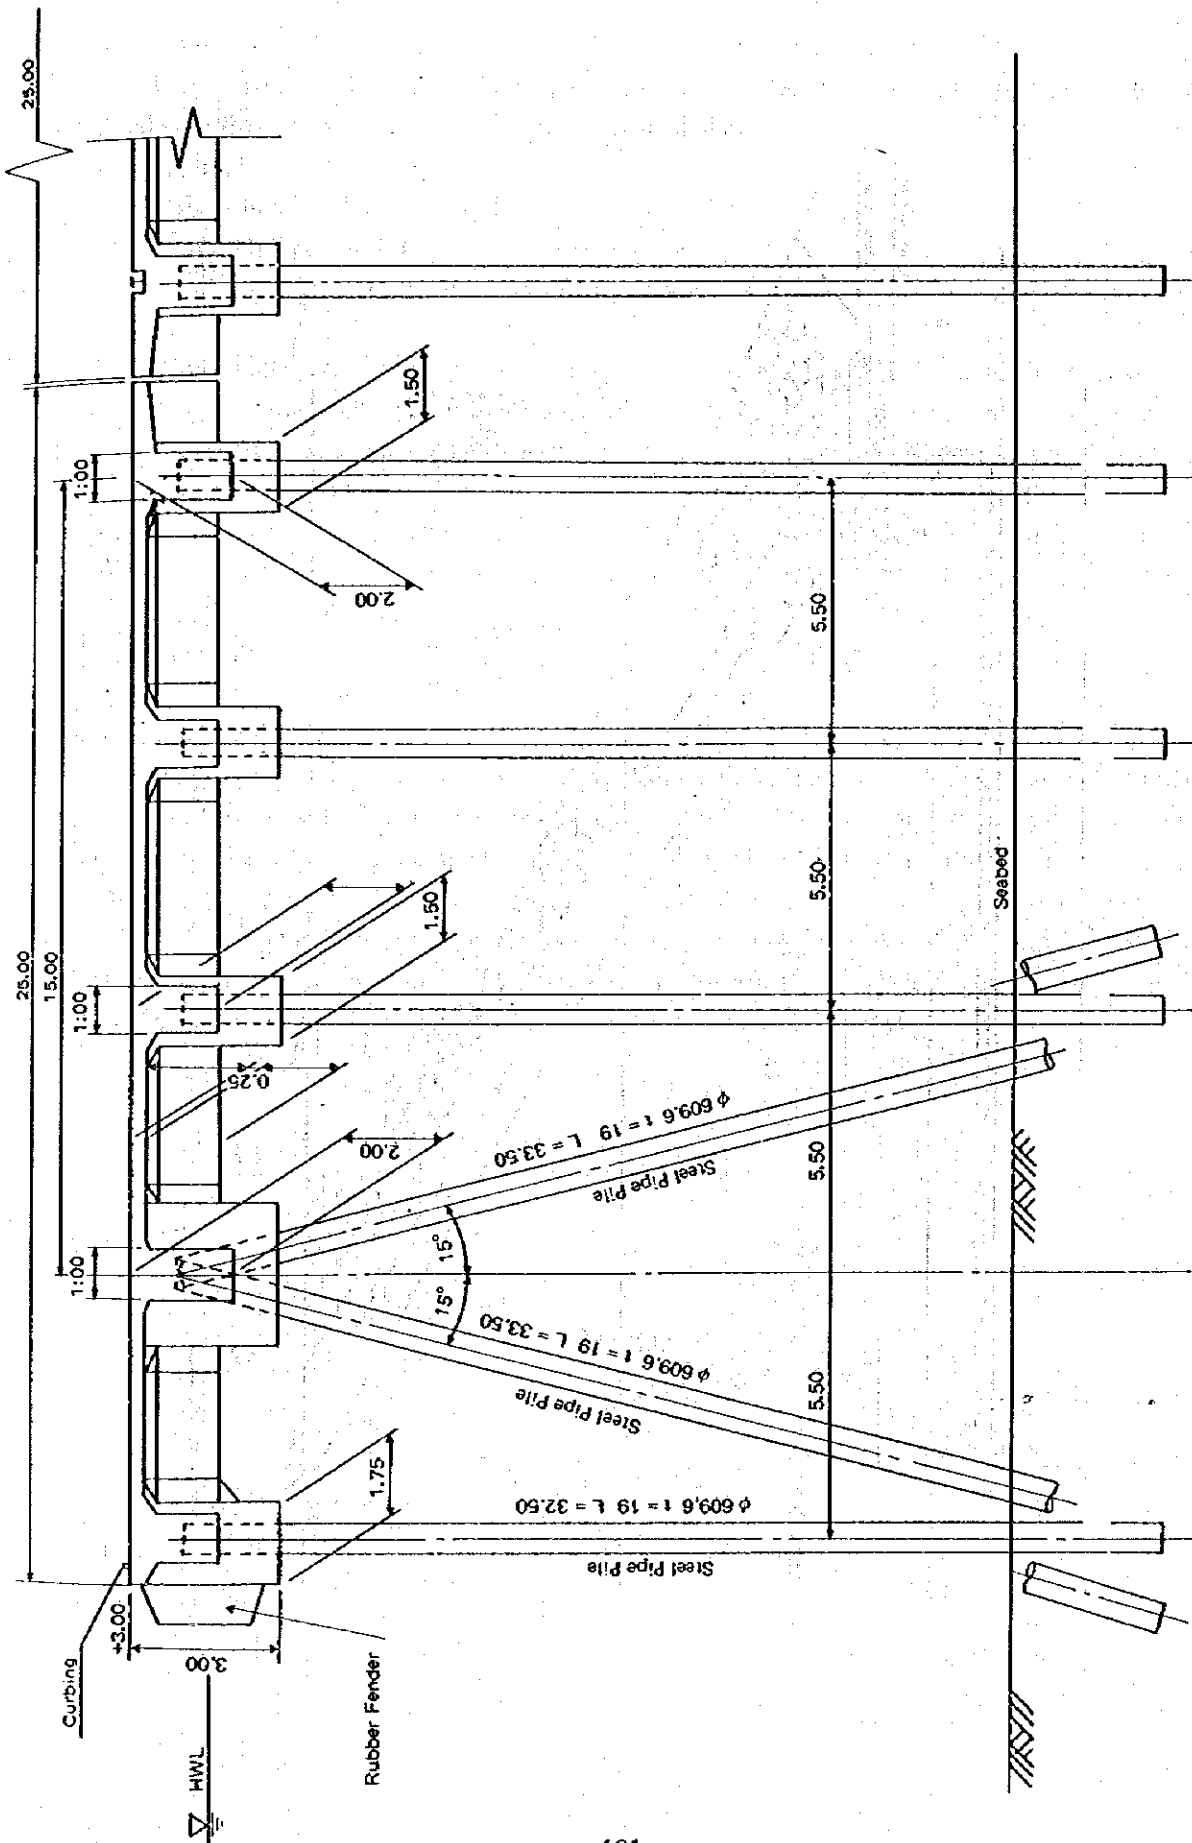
Typical Cross Section of Berthing Structure (Pile Jetty Type)
